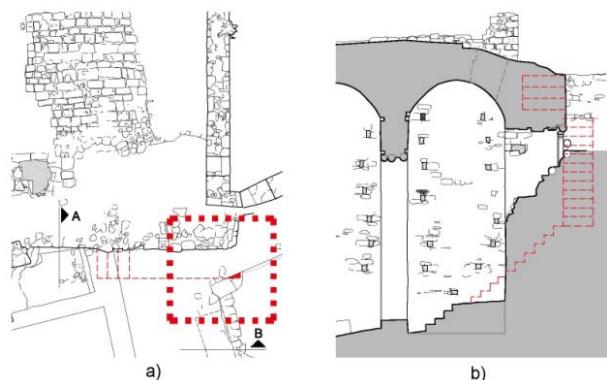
South Tower's survey Plans with special indication of staircase trace: a) ground plan; b) cross-section.
